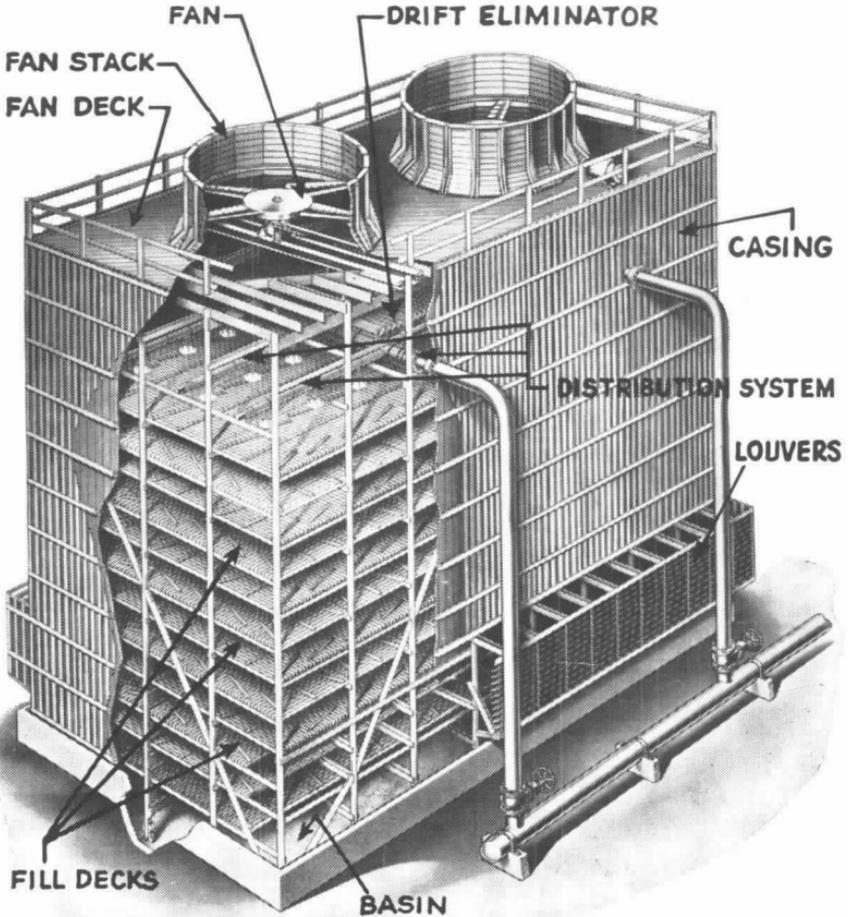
Typical induced draft counterflow water-cooling tower.
